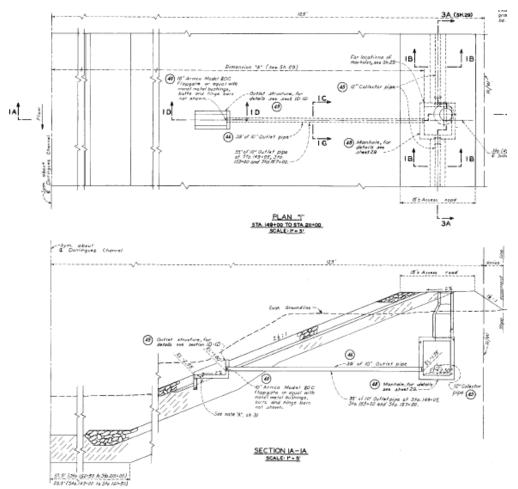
Subdrain detail drawings shown on Dominguez Channel as-builts
